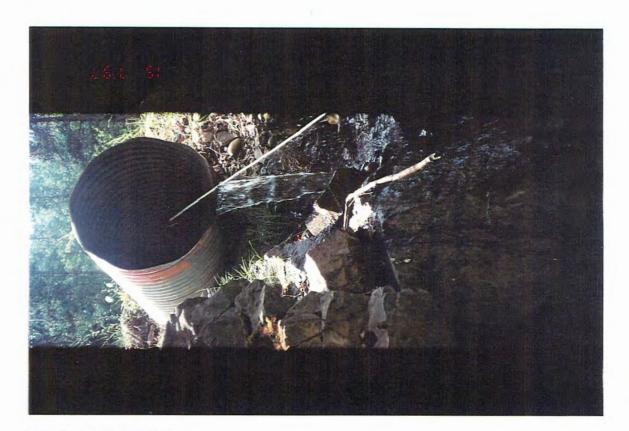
, 15-Jul-97 Site #: Z46, Looking upstream at a culvert barrier
